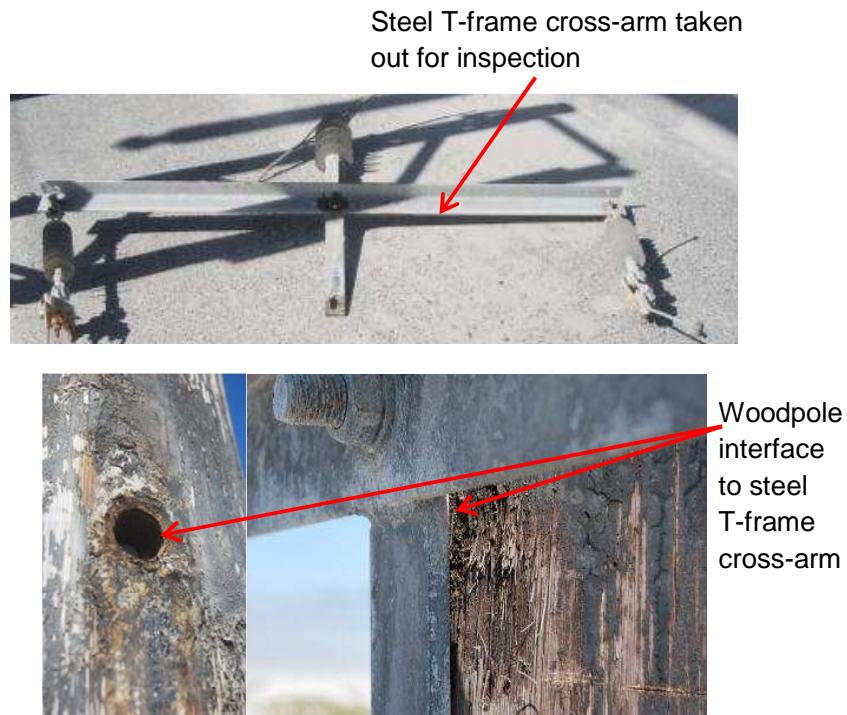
Daylight inspection on steel T-frame cross-arm interface with vertical woodpole
